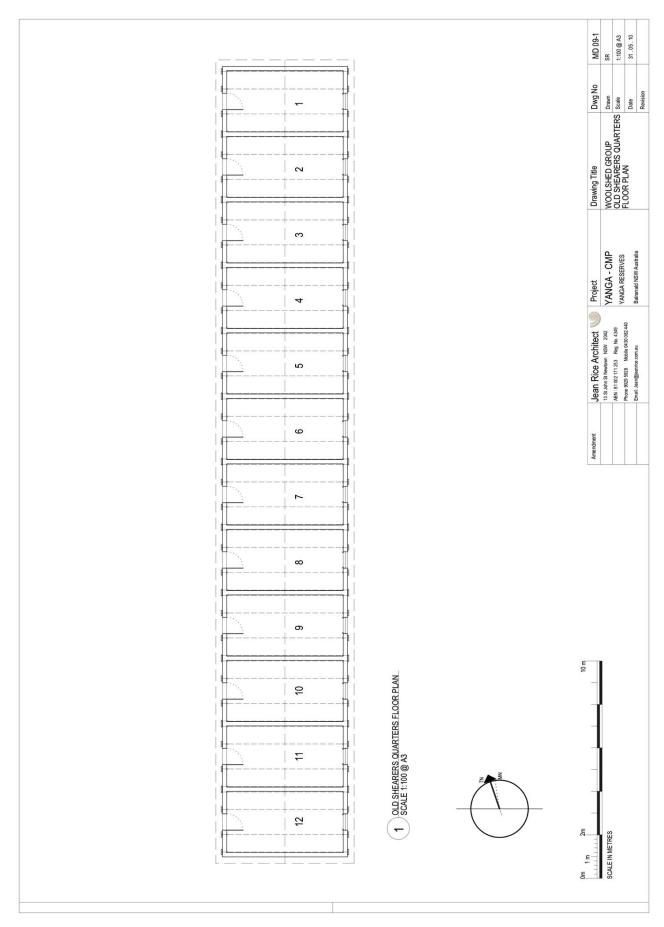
Woolshed Group Old Shearers' Quarters floor plan. Jean Rice Architect, site assessment 2009.
